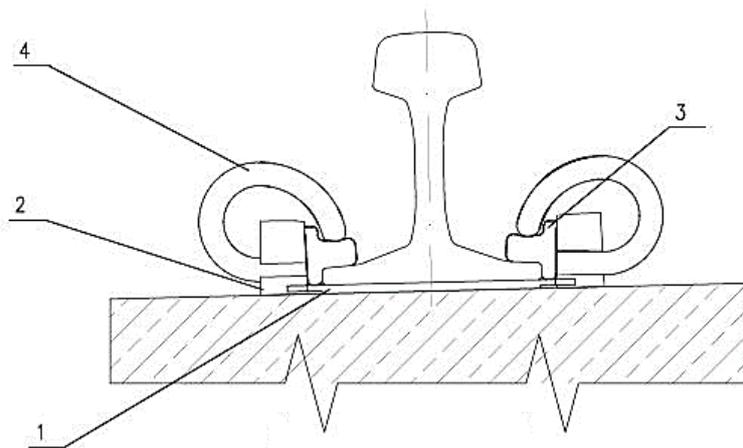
Fastening system type SB. 1 – rail pad, 2 – anchor, 3 – electric insulator, 4 – SB clamp
